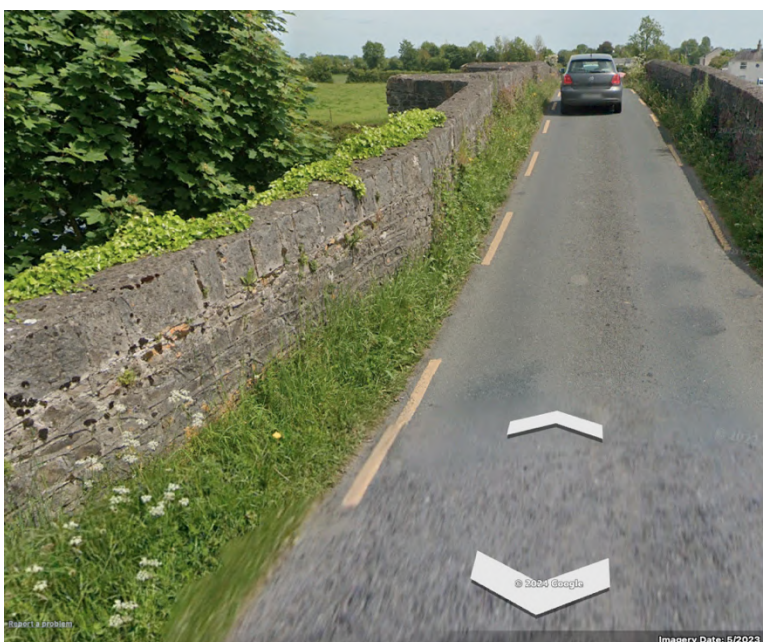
North wall and parapet on west side of Pass Bridge still intact (May 2023 Google Earth street view image)
